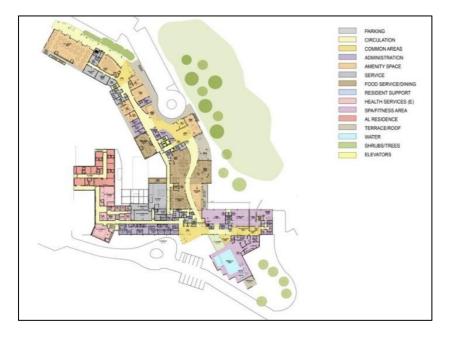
Layout plan of Rockwood South Hill Retirement (URL-30)
